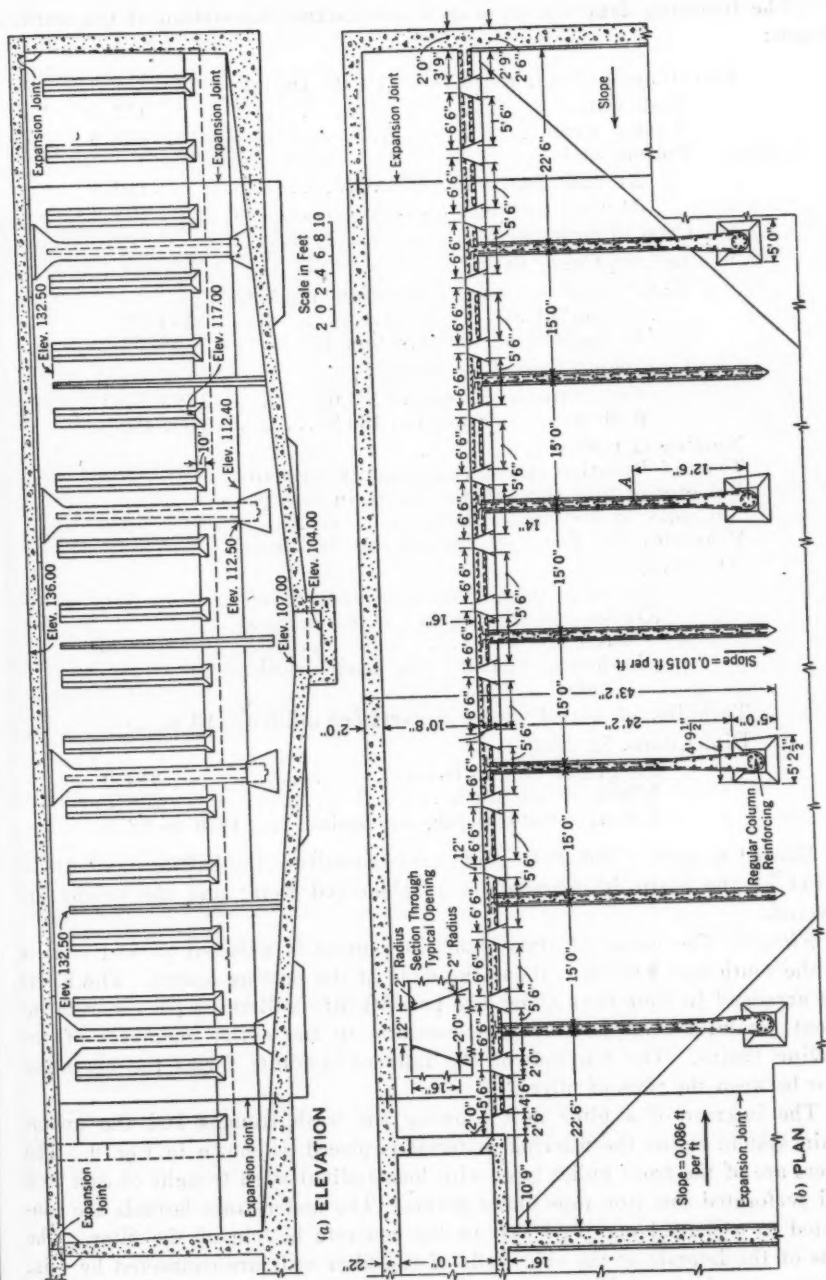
PLAN AND ELEVATION OF SETTLING BASIN INLET
